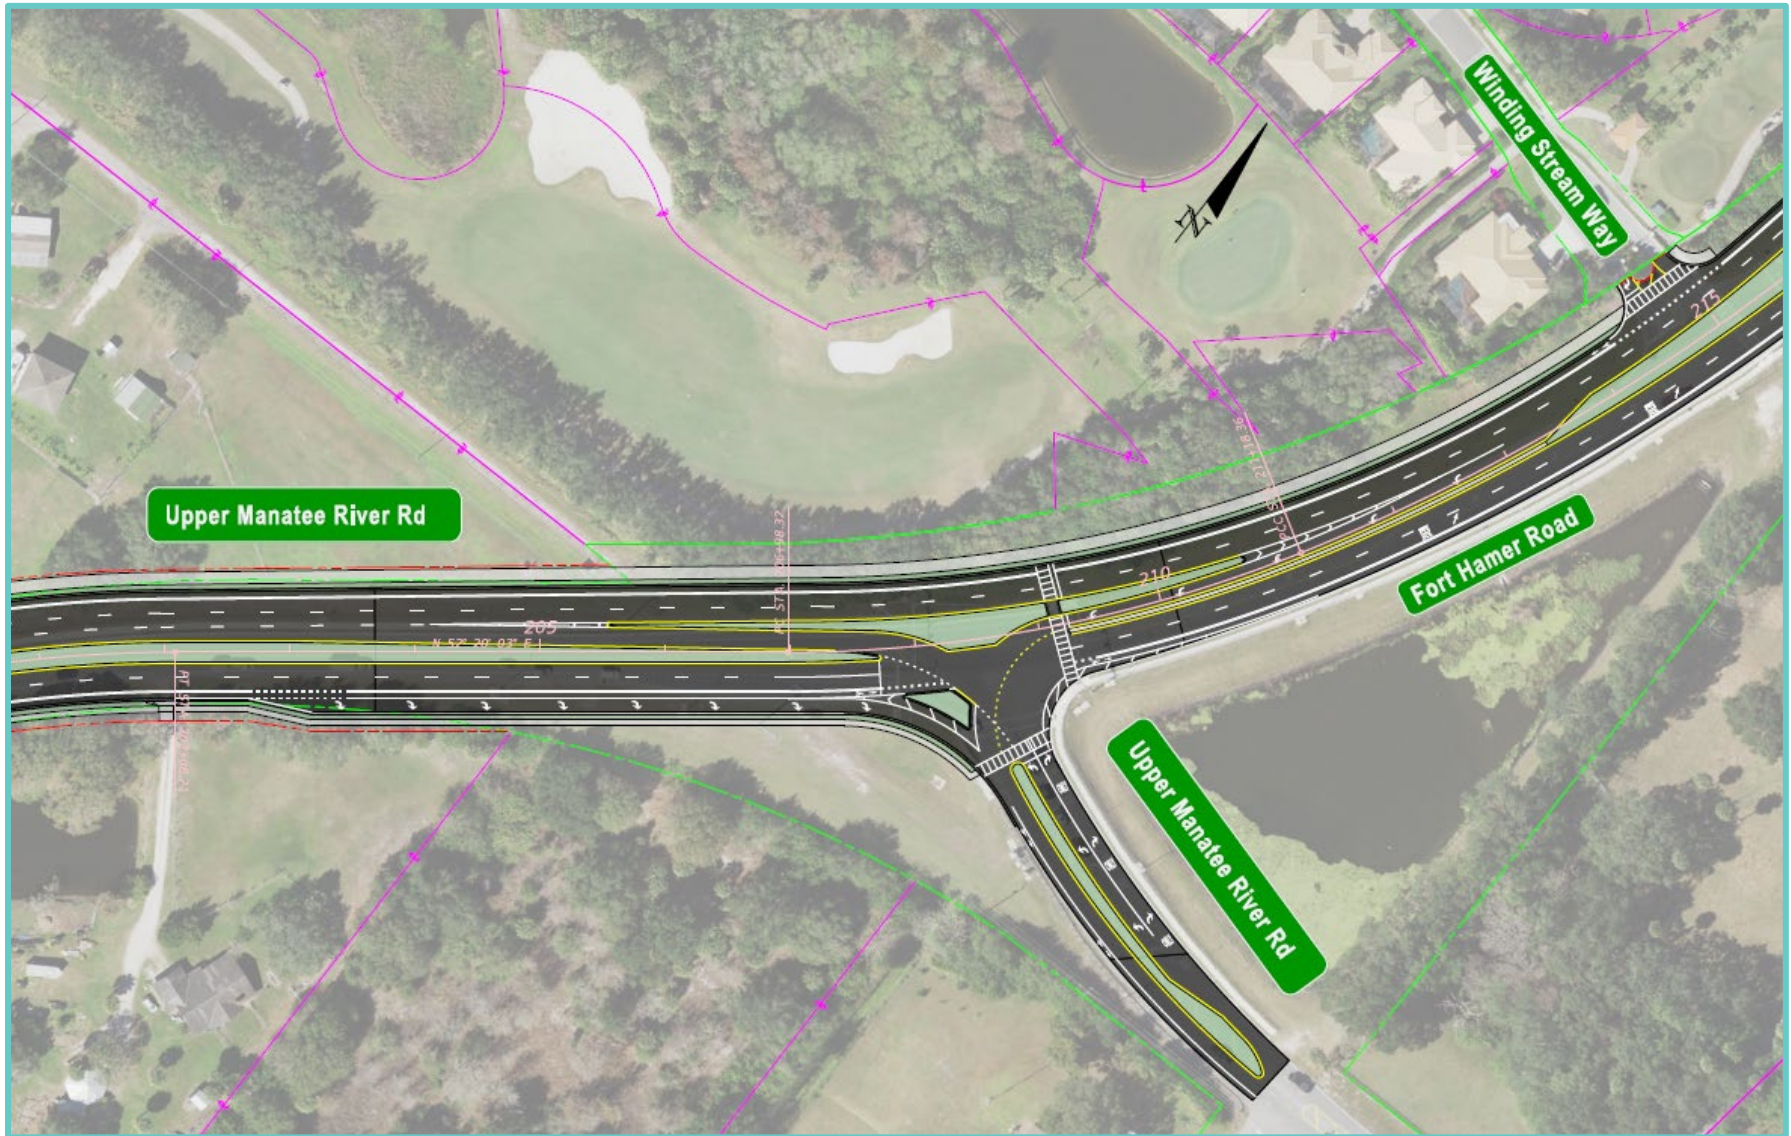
| Upper Manatee River Road at Fort Hamer Road – Florida T Intersection
